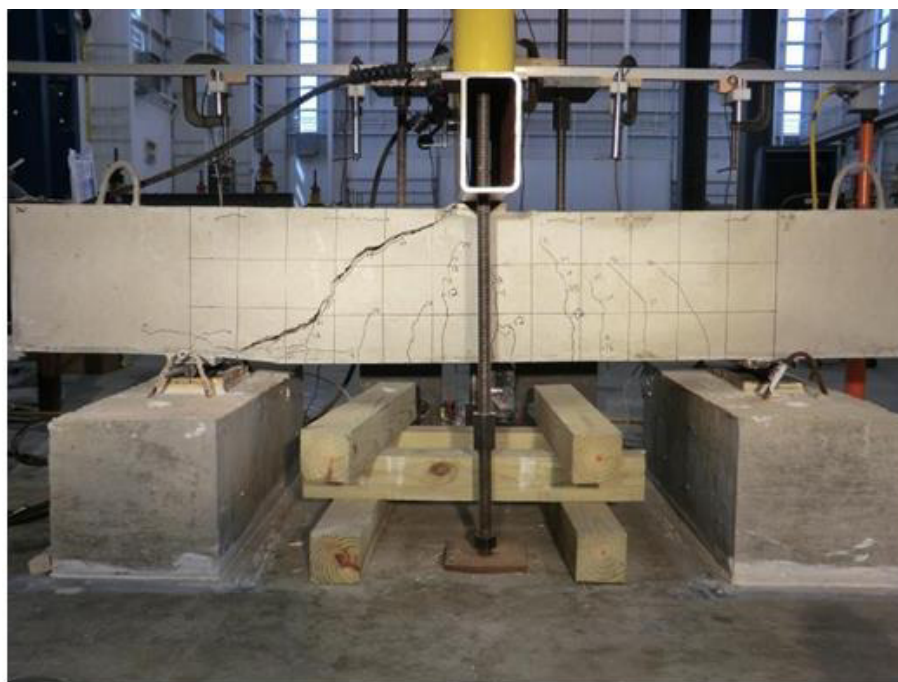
A cracked concrete beam image in lab from data center hub repository [50].
